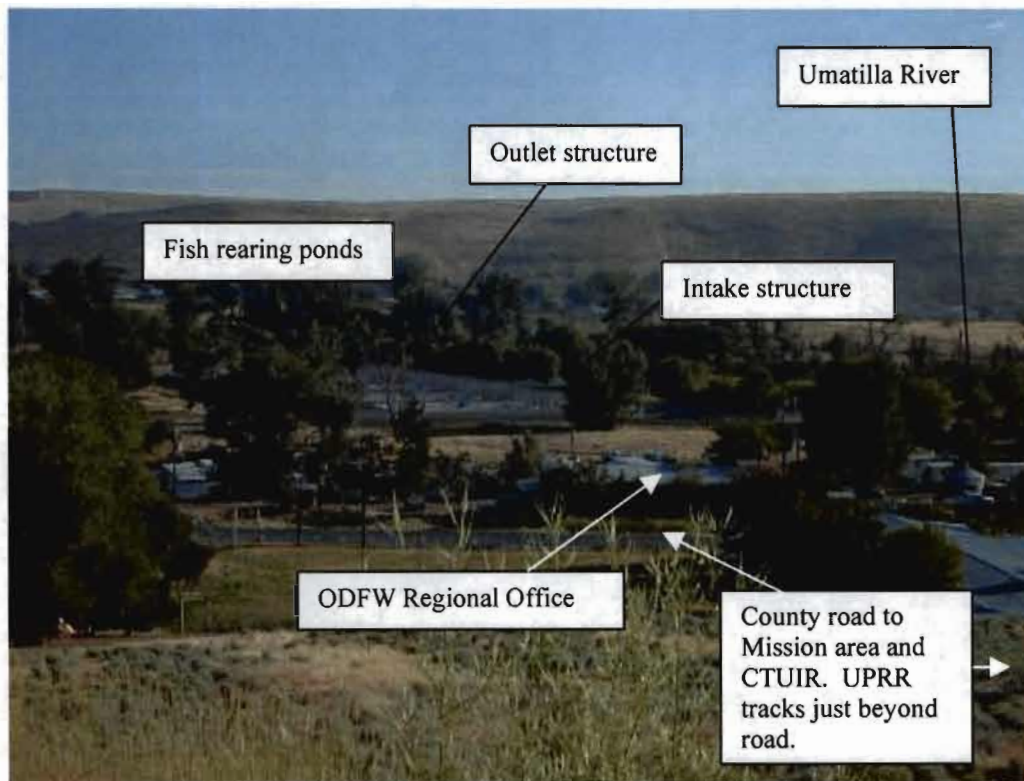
View looks north at new CTUIR/ODFW fish rearing pond facility. Intake and outlet structure could act as groins, directing flood flows toward north bank and the Riverside area.
